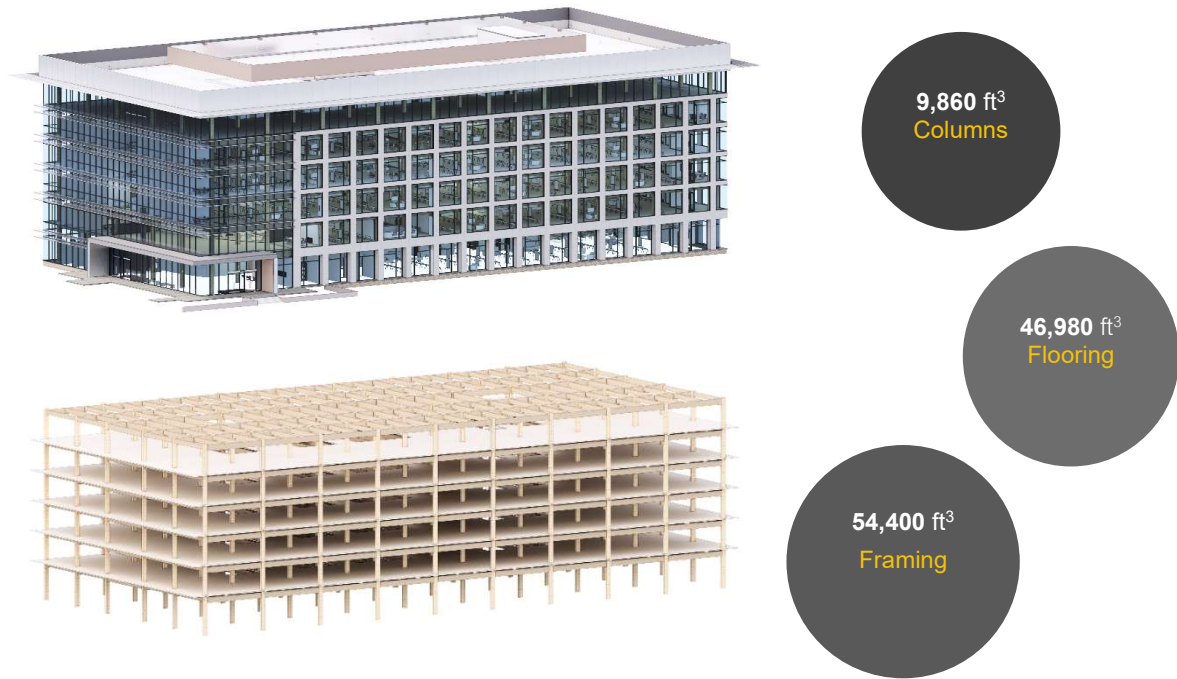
Case study illustrating timber volume in square feet for structural columns, framing, and flooring
